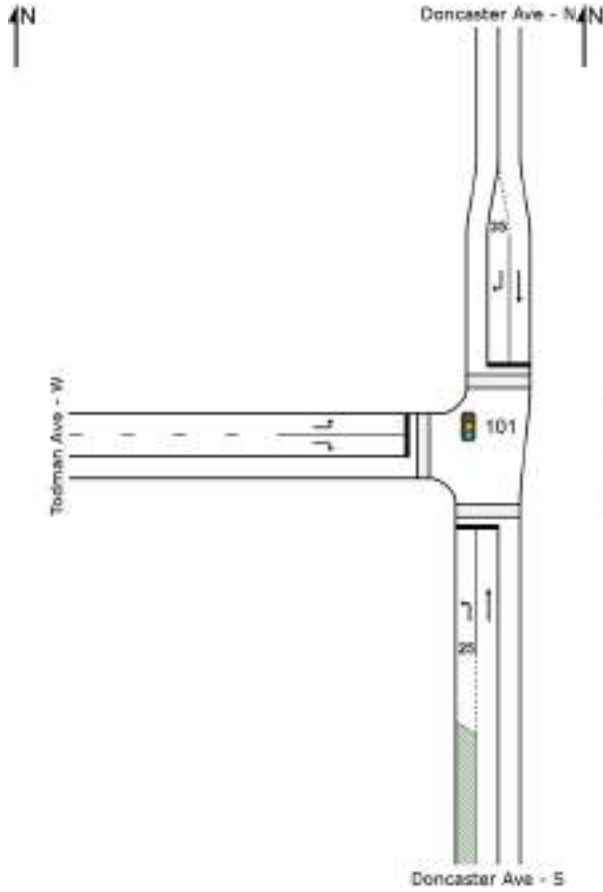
Proposed Doncaster Avenue/ Todman Avenue layout
